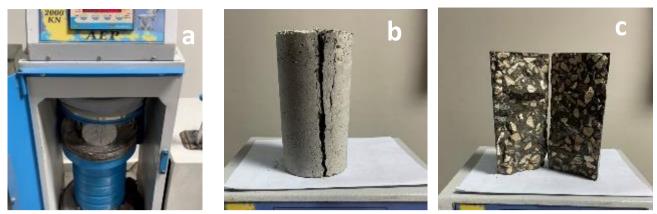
Splitting tensile machine: (a) Cylinder during the test, (b) and (c) Cylinder after failure
